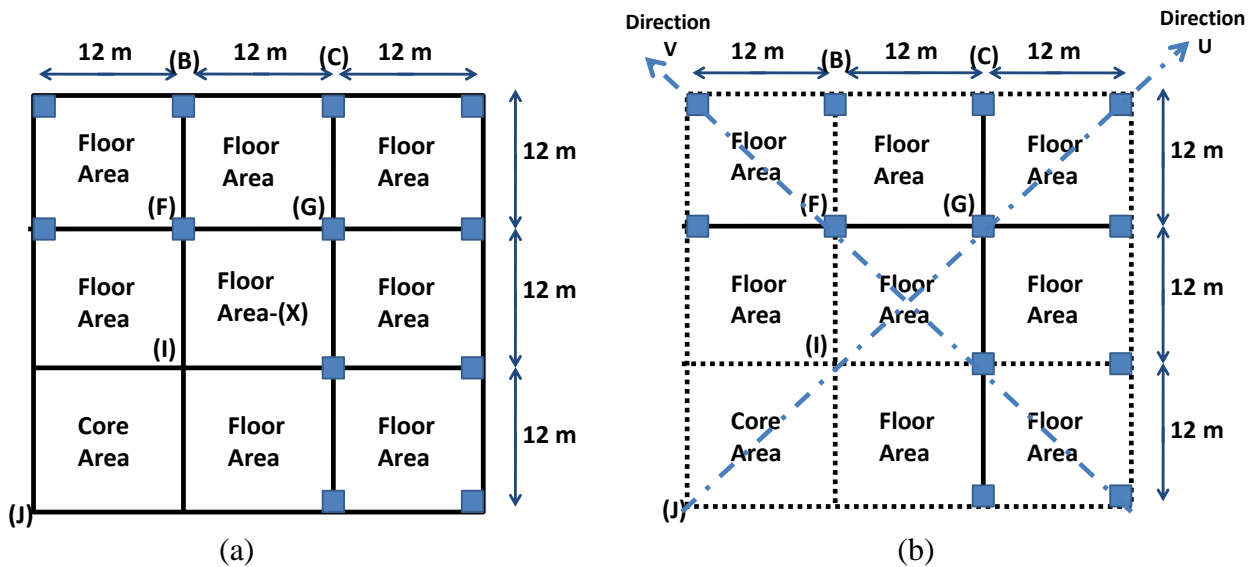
(a) typical plan view of the building and (b) locations of the shear walls in the outrigger and belt systems (dotted lines)
